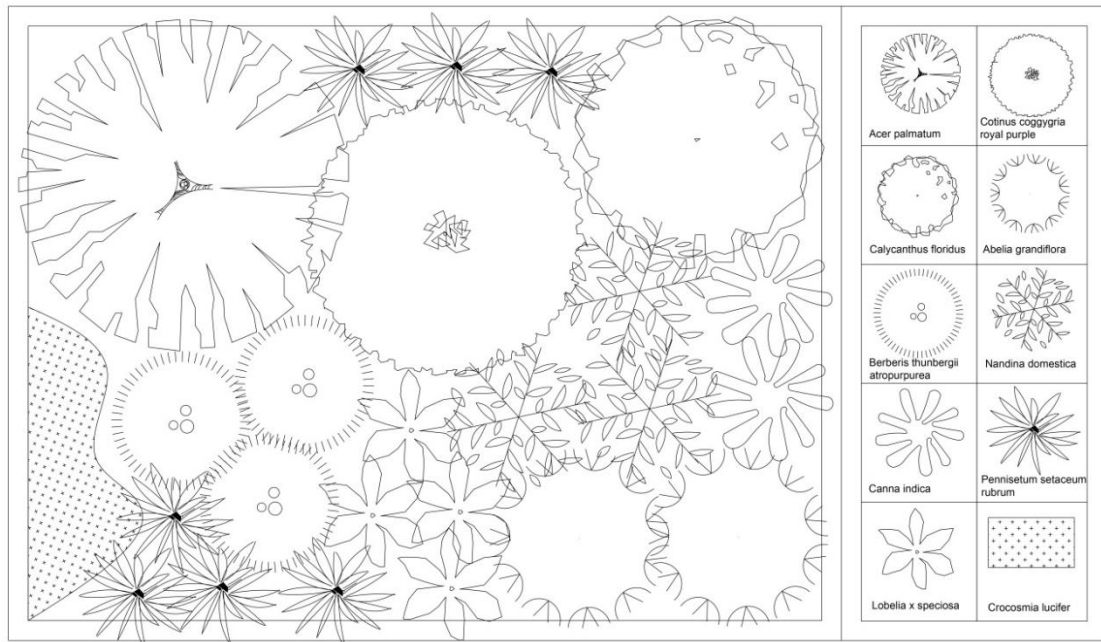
Planting design plan with red color effect (Scale: 1/40)
